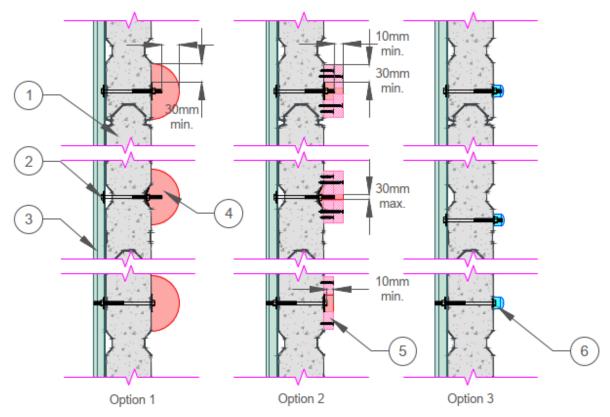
Loading applied to the vertically installed Speedpanel wall with through bolts
